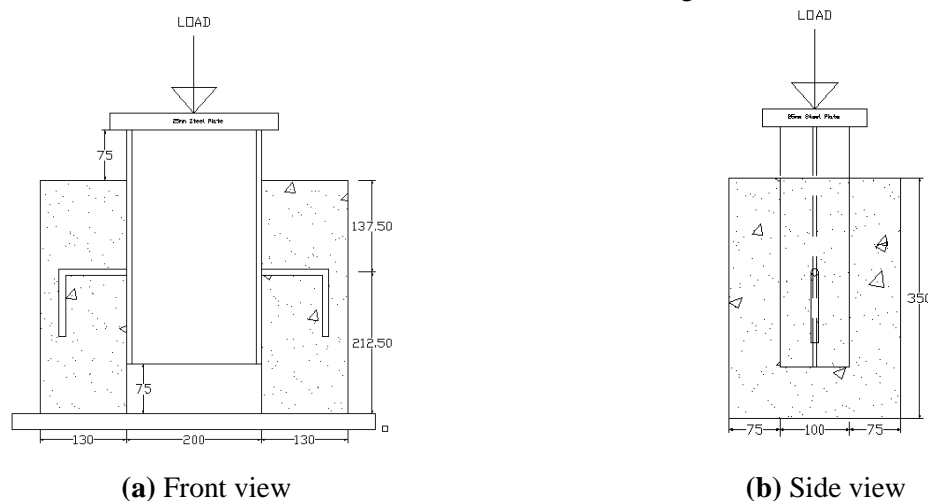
Push-out test specimen with Rebar Connector (units in mm)
